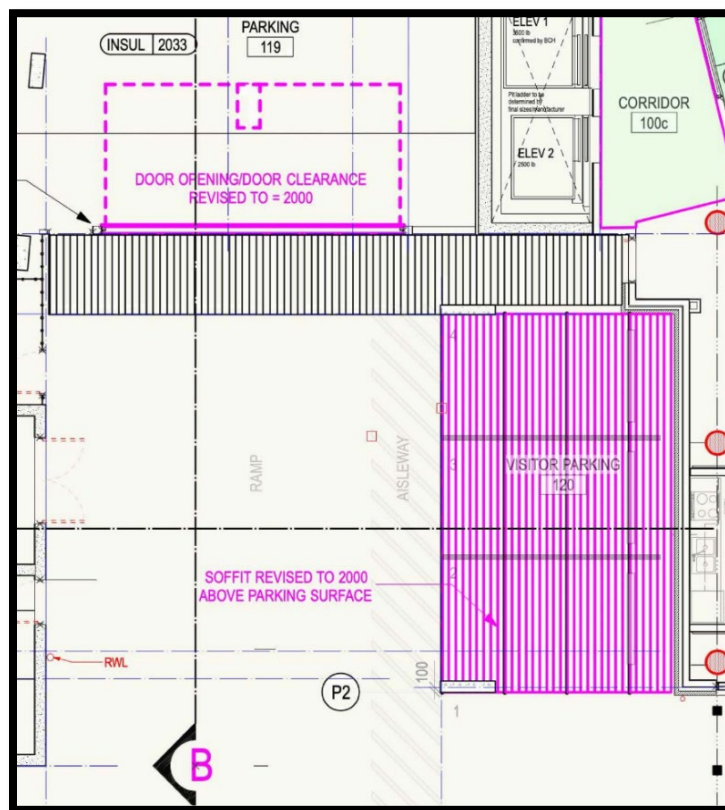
Three parking spaces and garage door opening subject to a 2m height clearance
